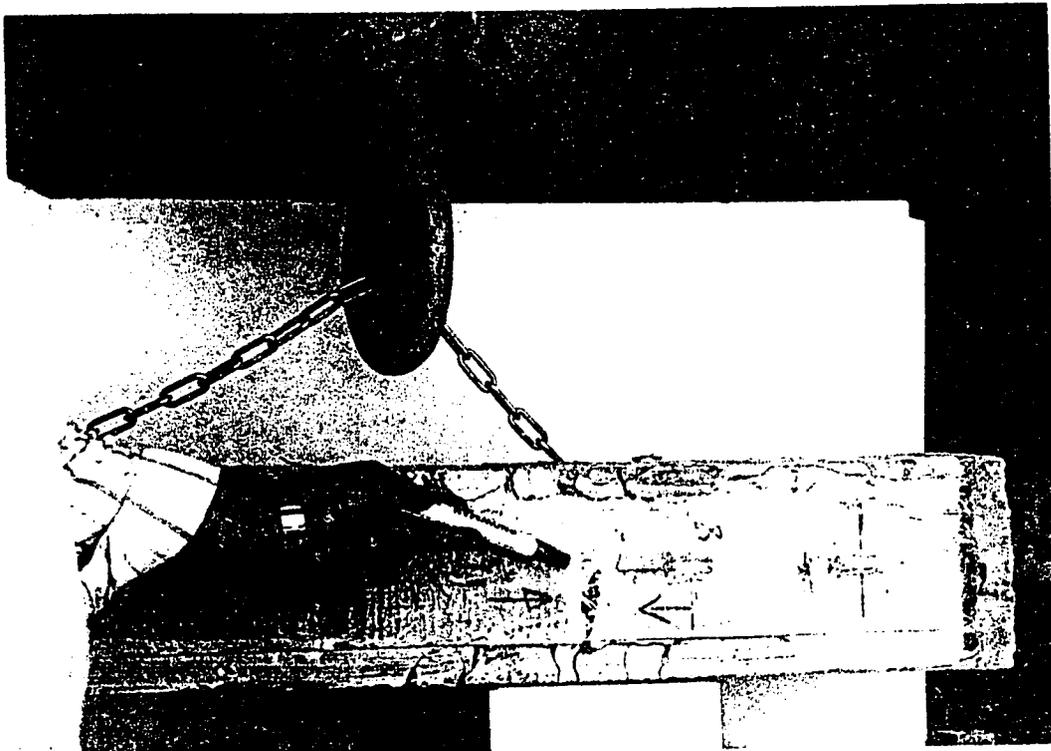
Failure Mode of Beam FP1 (Rupturing of the Plate Followed by Crushing of Concrete).
